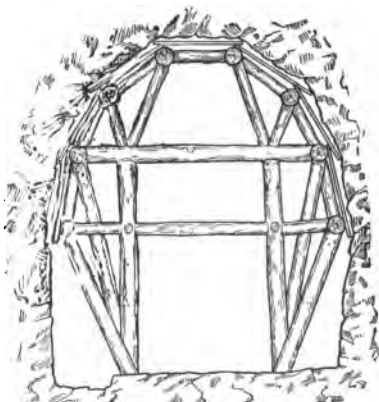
Fully-developed timbering in the Simplon Tunnel, inside which the masonry lining is built. Polling boards are placed between the timbering and the ground.
